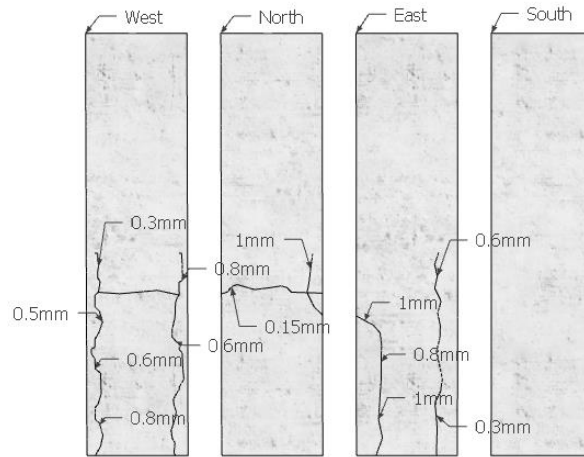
Cracking pattern of column L-15-Str post corrosion
